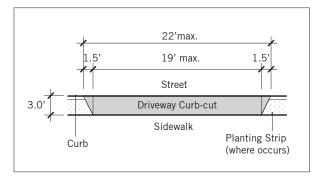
j: Curb cut serving a parking garage driveway for a multi-unit building
